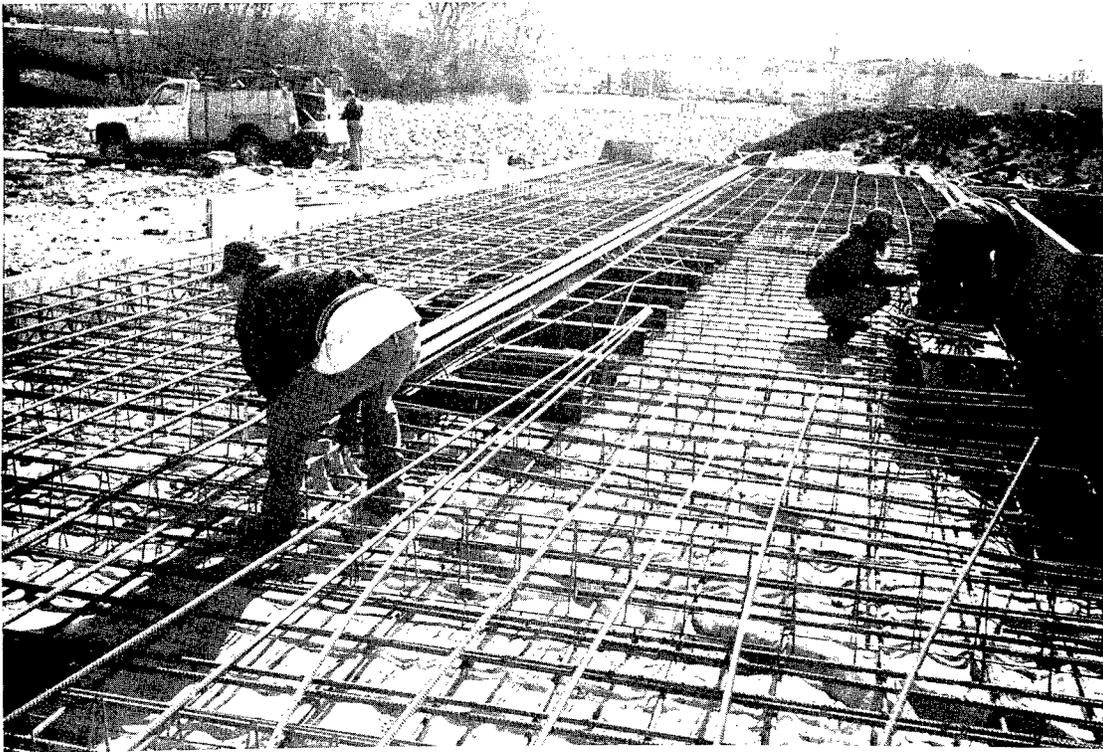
Reinforcement of the 18" Floor and the Testing Machine Tracks
